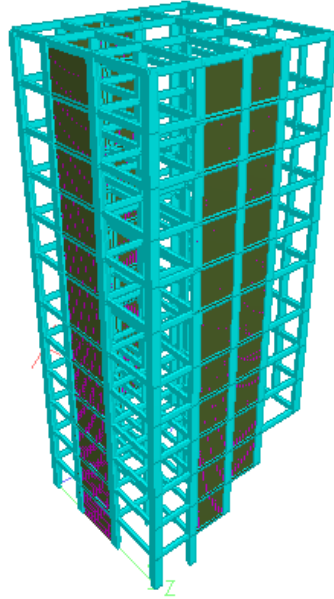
Isometric view of Hostel no. 05 with Shear Walls at center
